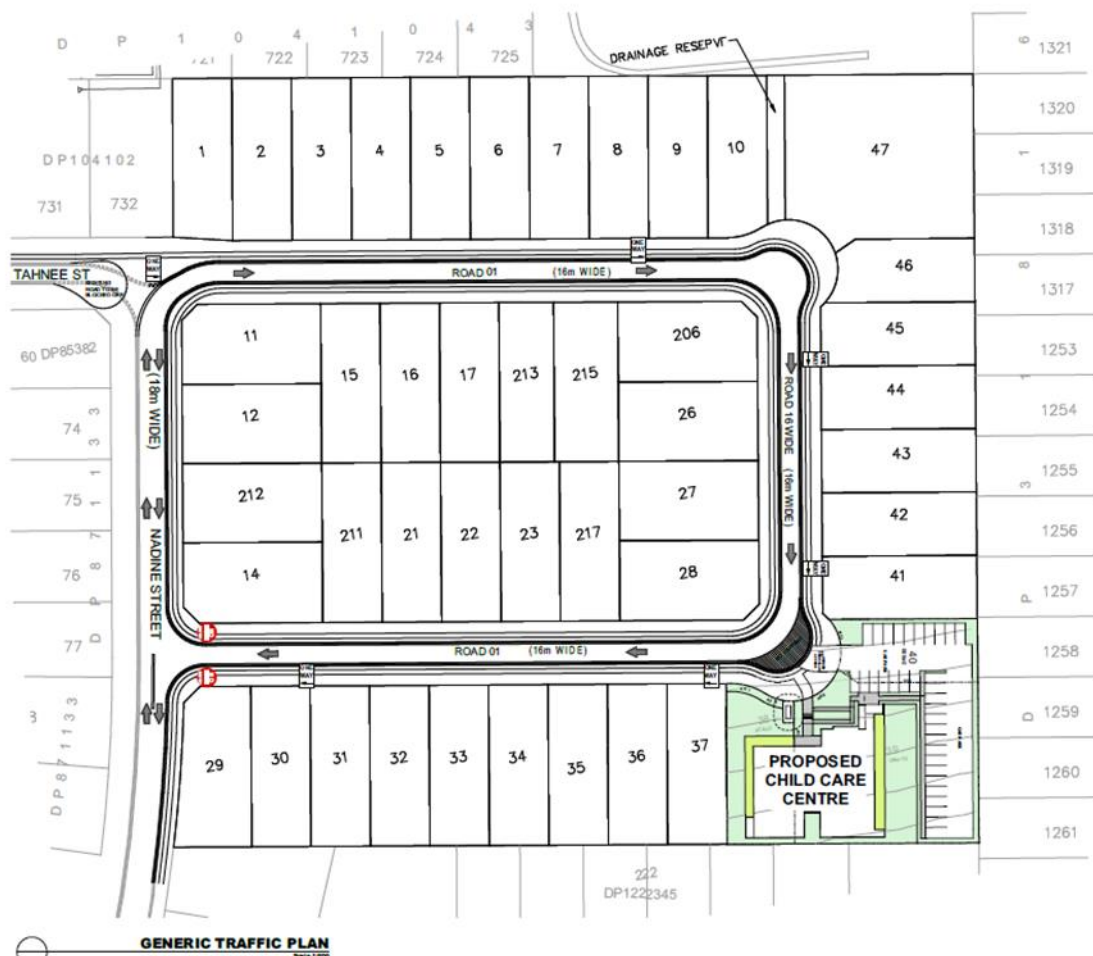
General traffic plan proposed to implement a one-way operation to Tahnee Street and partial closure of Tahnee Street and construction of a cul-de-sac head to make the portion of Tahnee Street between Anson and Nadine Street a no through road.
